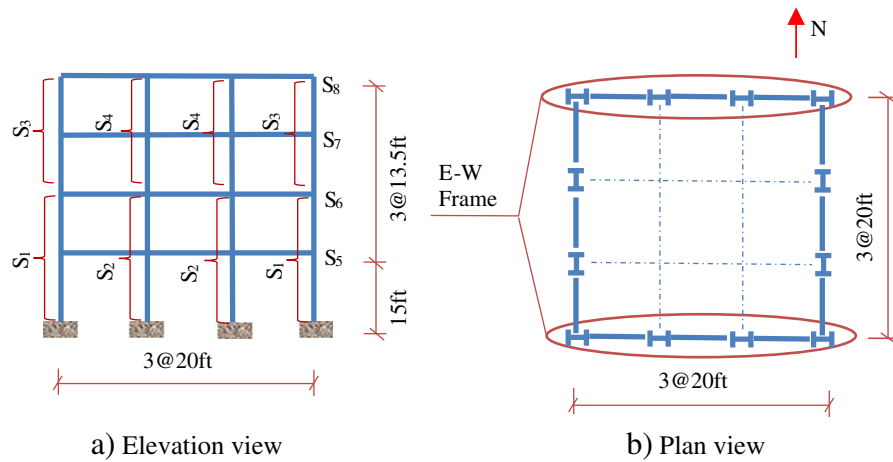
Elevation view and plan view of the example steel moment resisting frame.
